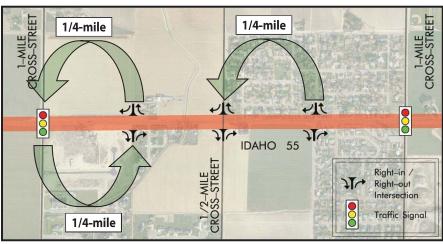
Typical one-mile rural segment – Snake River Bridge to 10<sup>th</sup> Avenue
